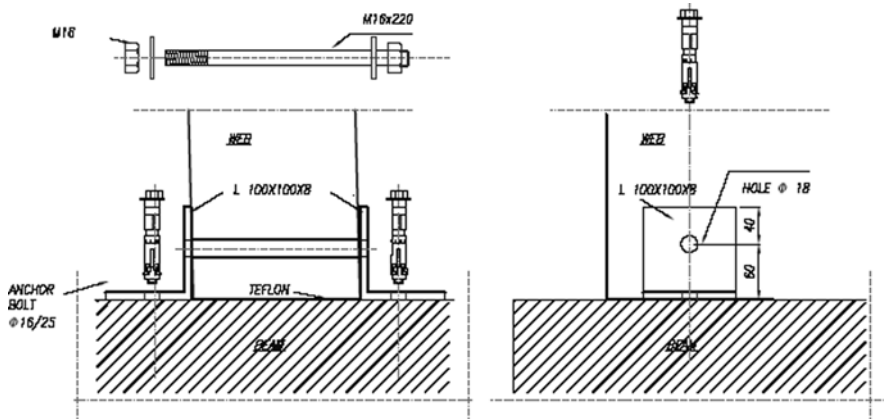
Executive drawings for the connection between a ribbed element and the supporting beam
